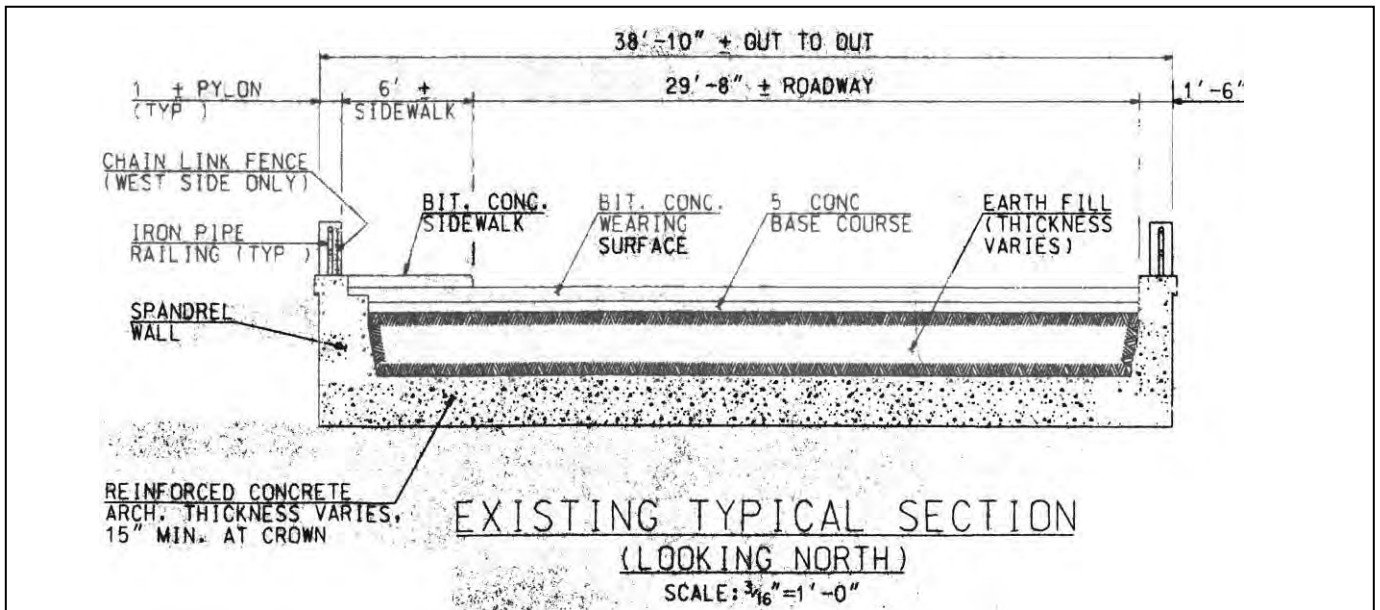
General Nomenclature of Existing Landing Road Bridge
